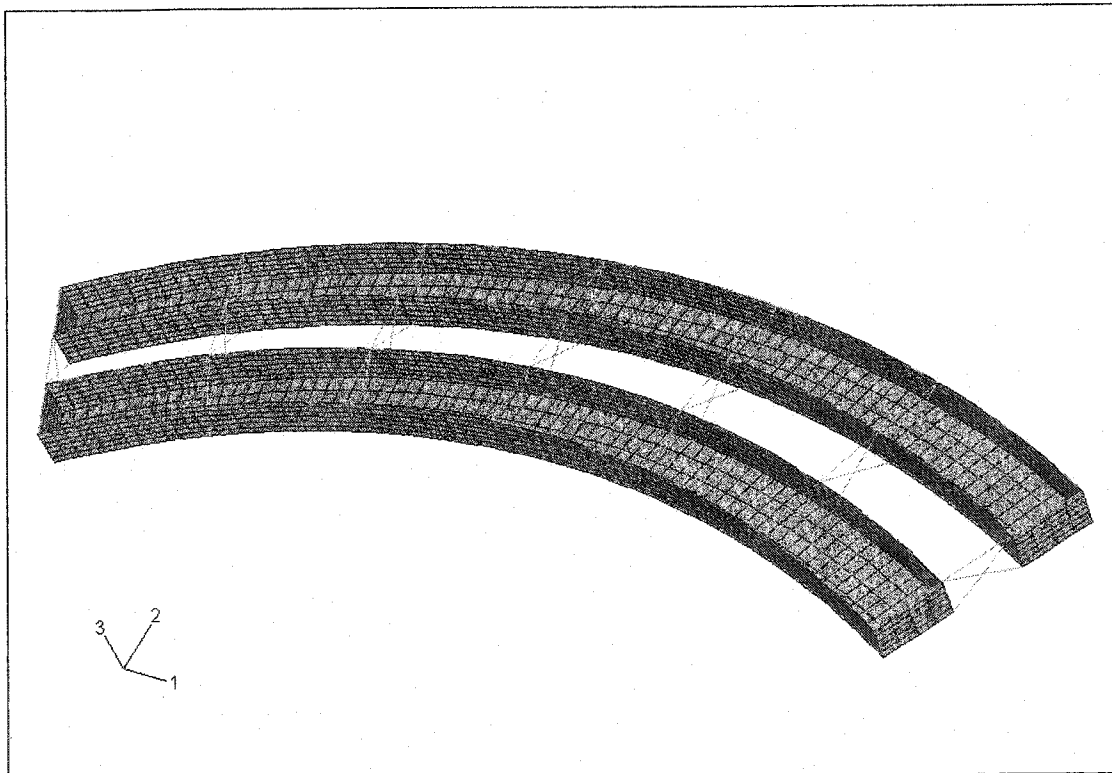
ABAQUS model view of bridge model M1 without concrete deck
